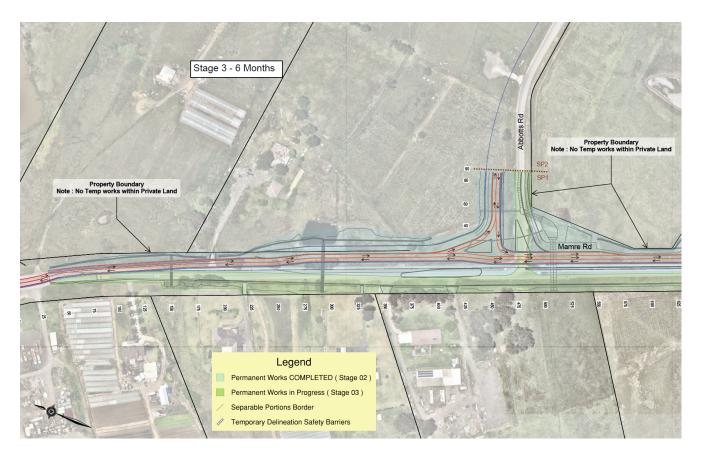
Mamre Road / Abbotts Road Upgrade - Construction Stage 3 - Refer to Robson Staging Plan
